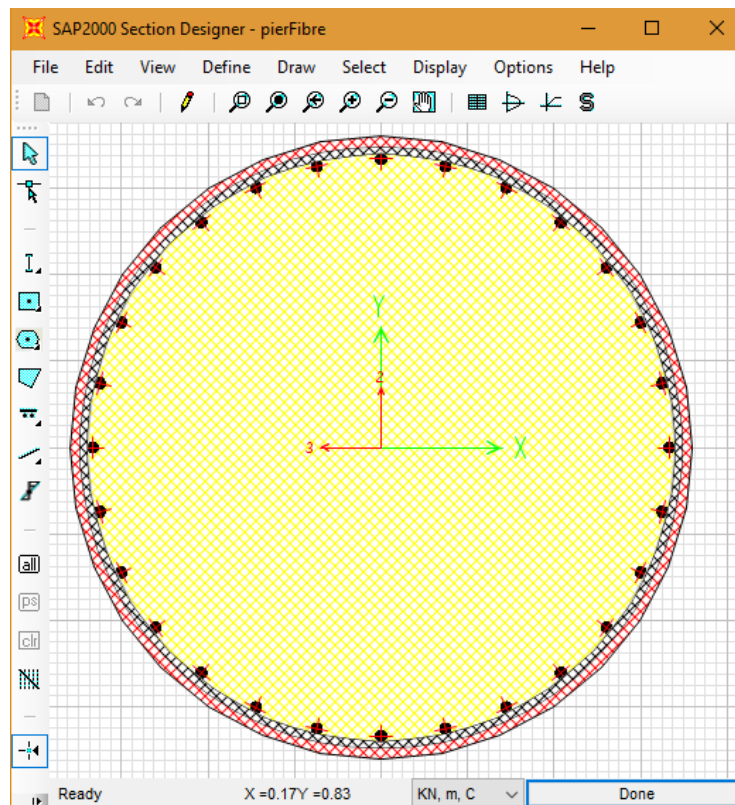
(b): Short Column Section Designed as per IRC:6-2014
